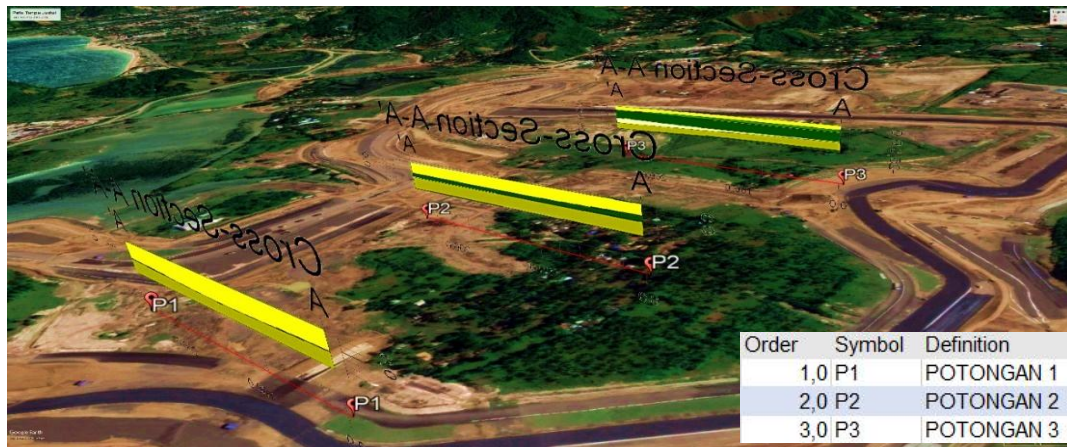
Cross-sectional section of the Mandalika Circuit Building Area
